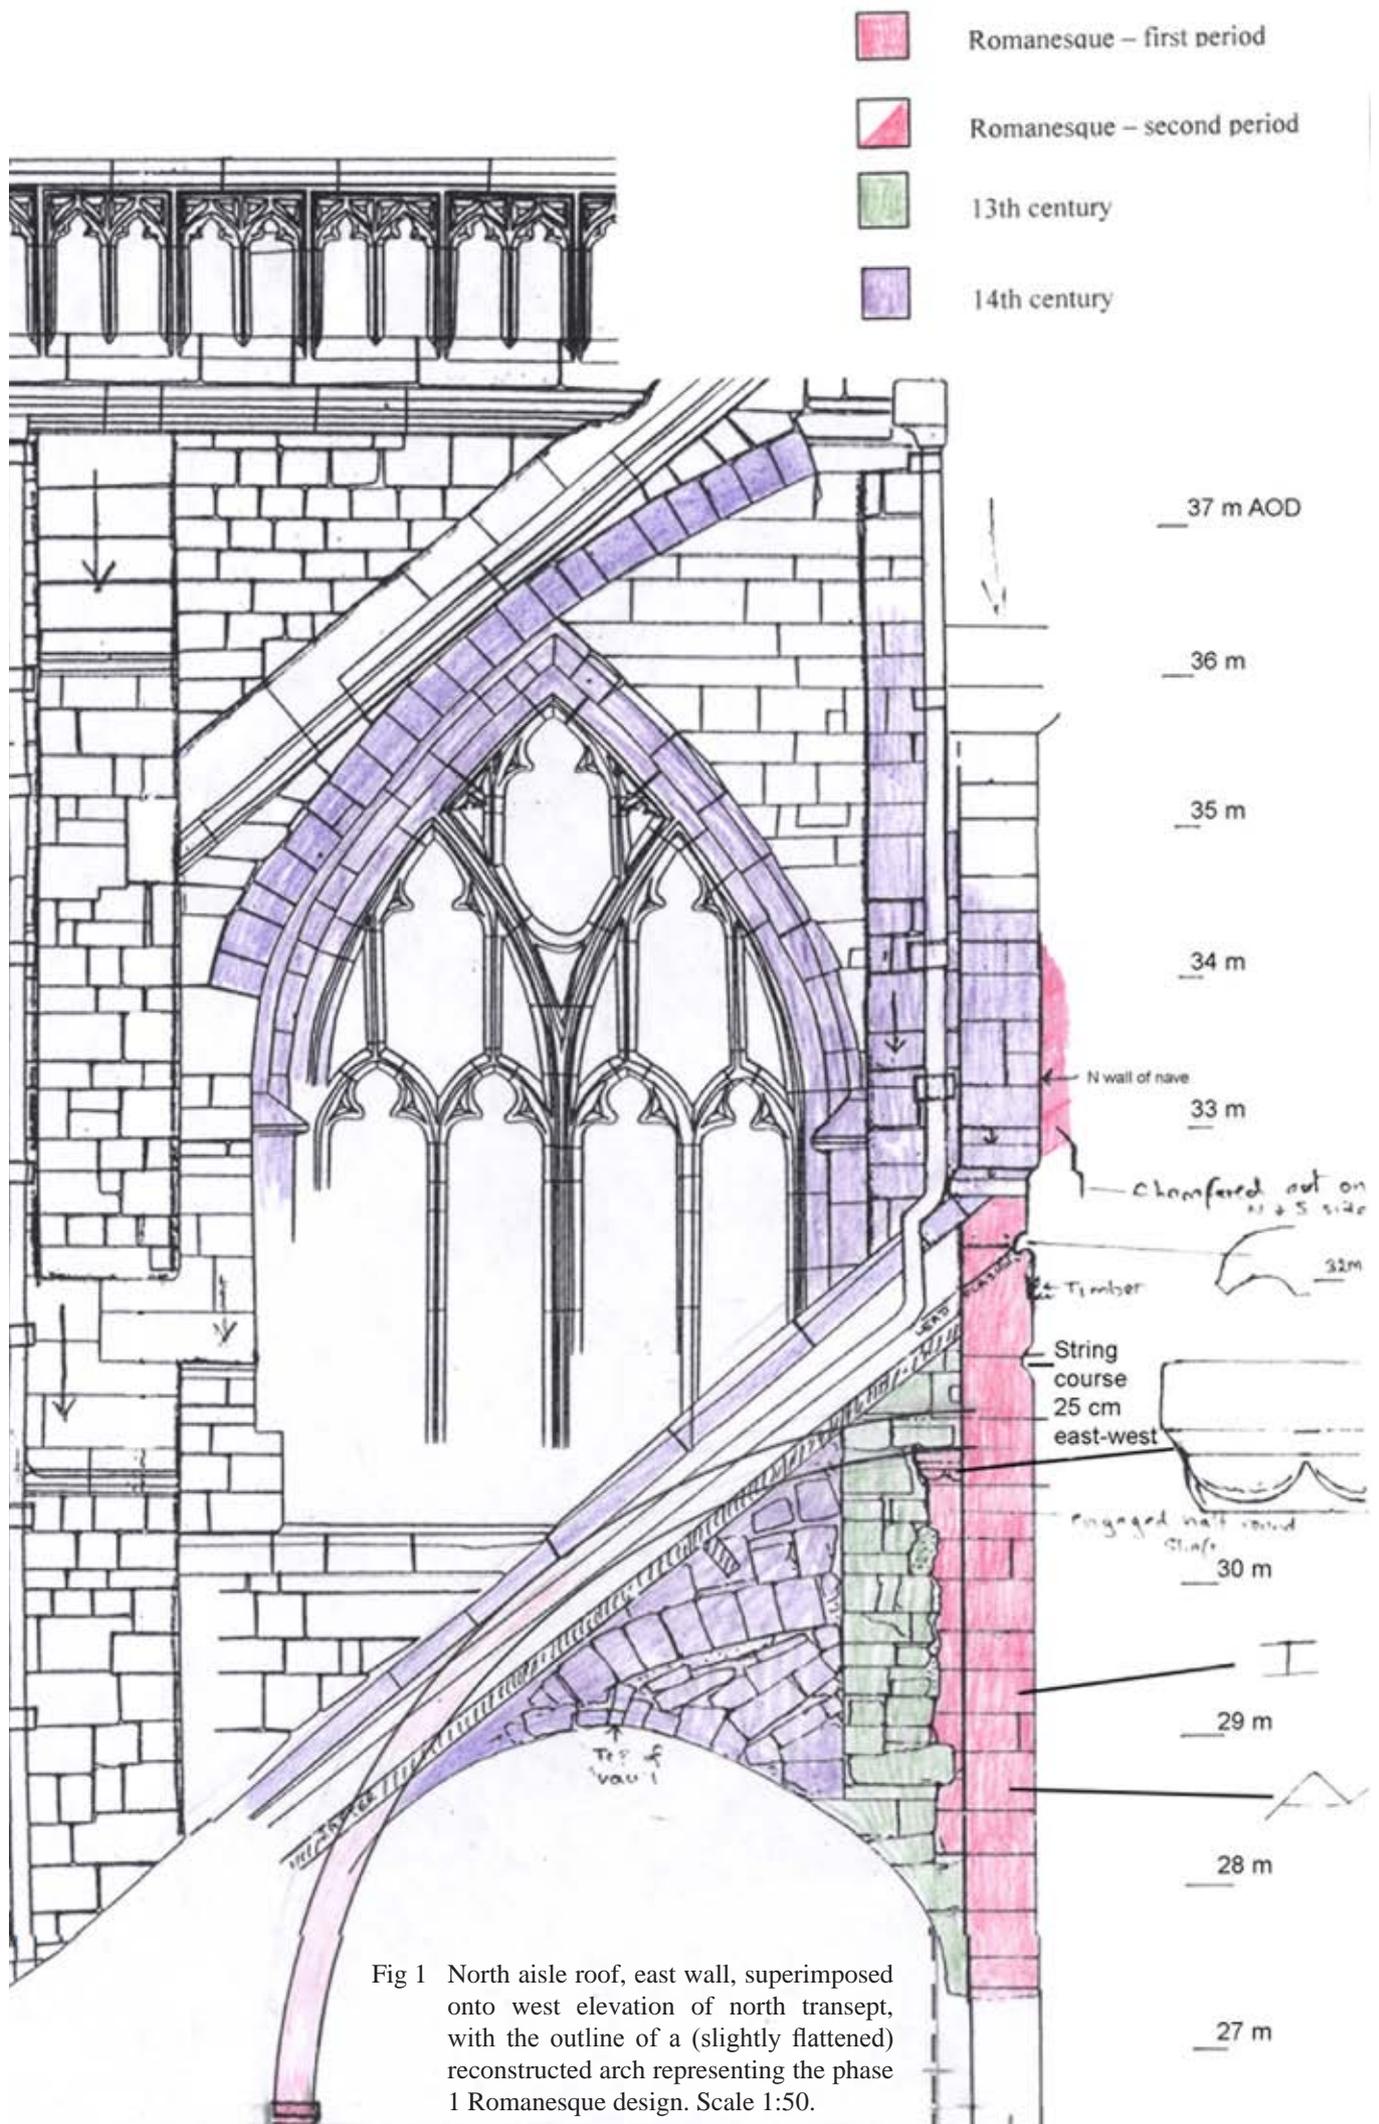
North aisle roof, east wall, superimposed onto west elevation of north transept, with the outline of a (slightly flattened) reconstructed arch representing the phase 1 Romanesque design. Scale 1:50.
